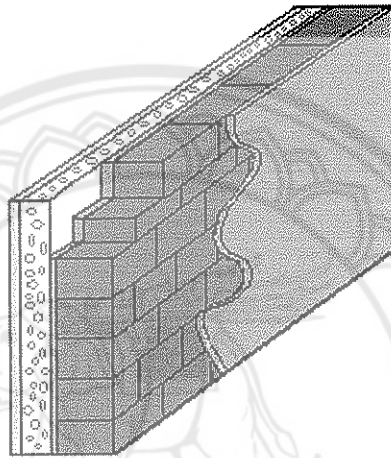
Brick with cement coating wall are installed glass fiber insulation
